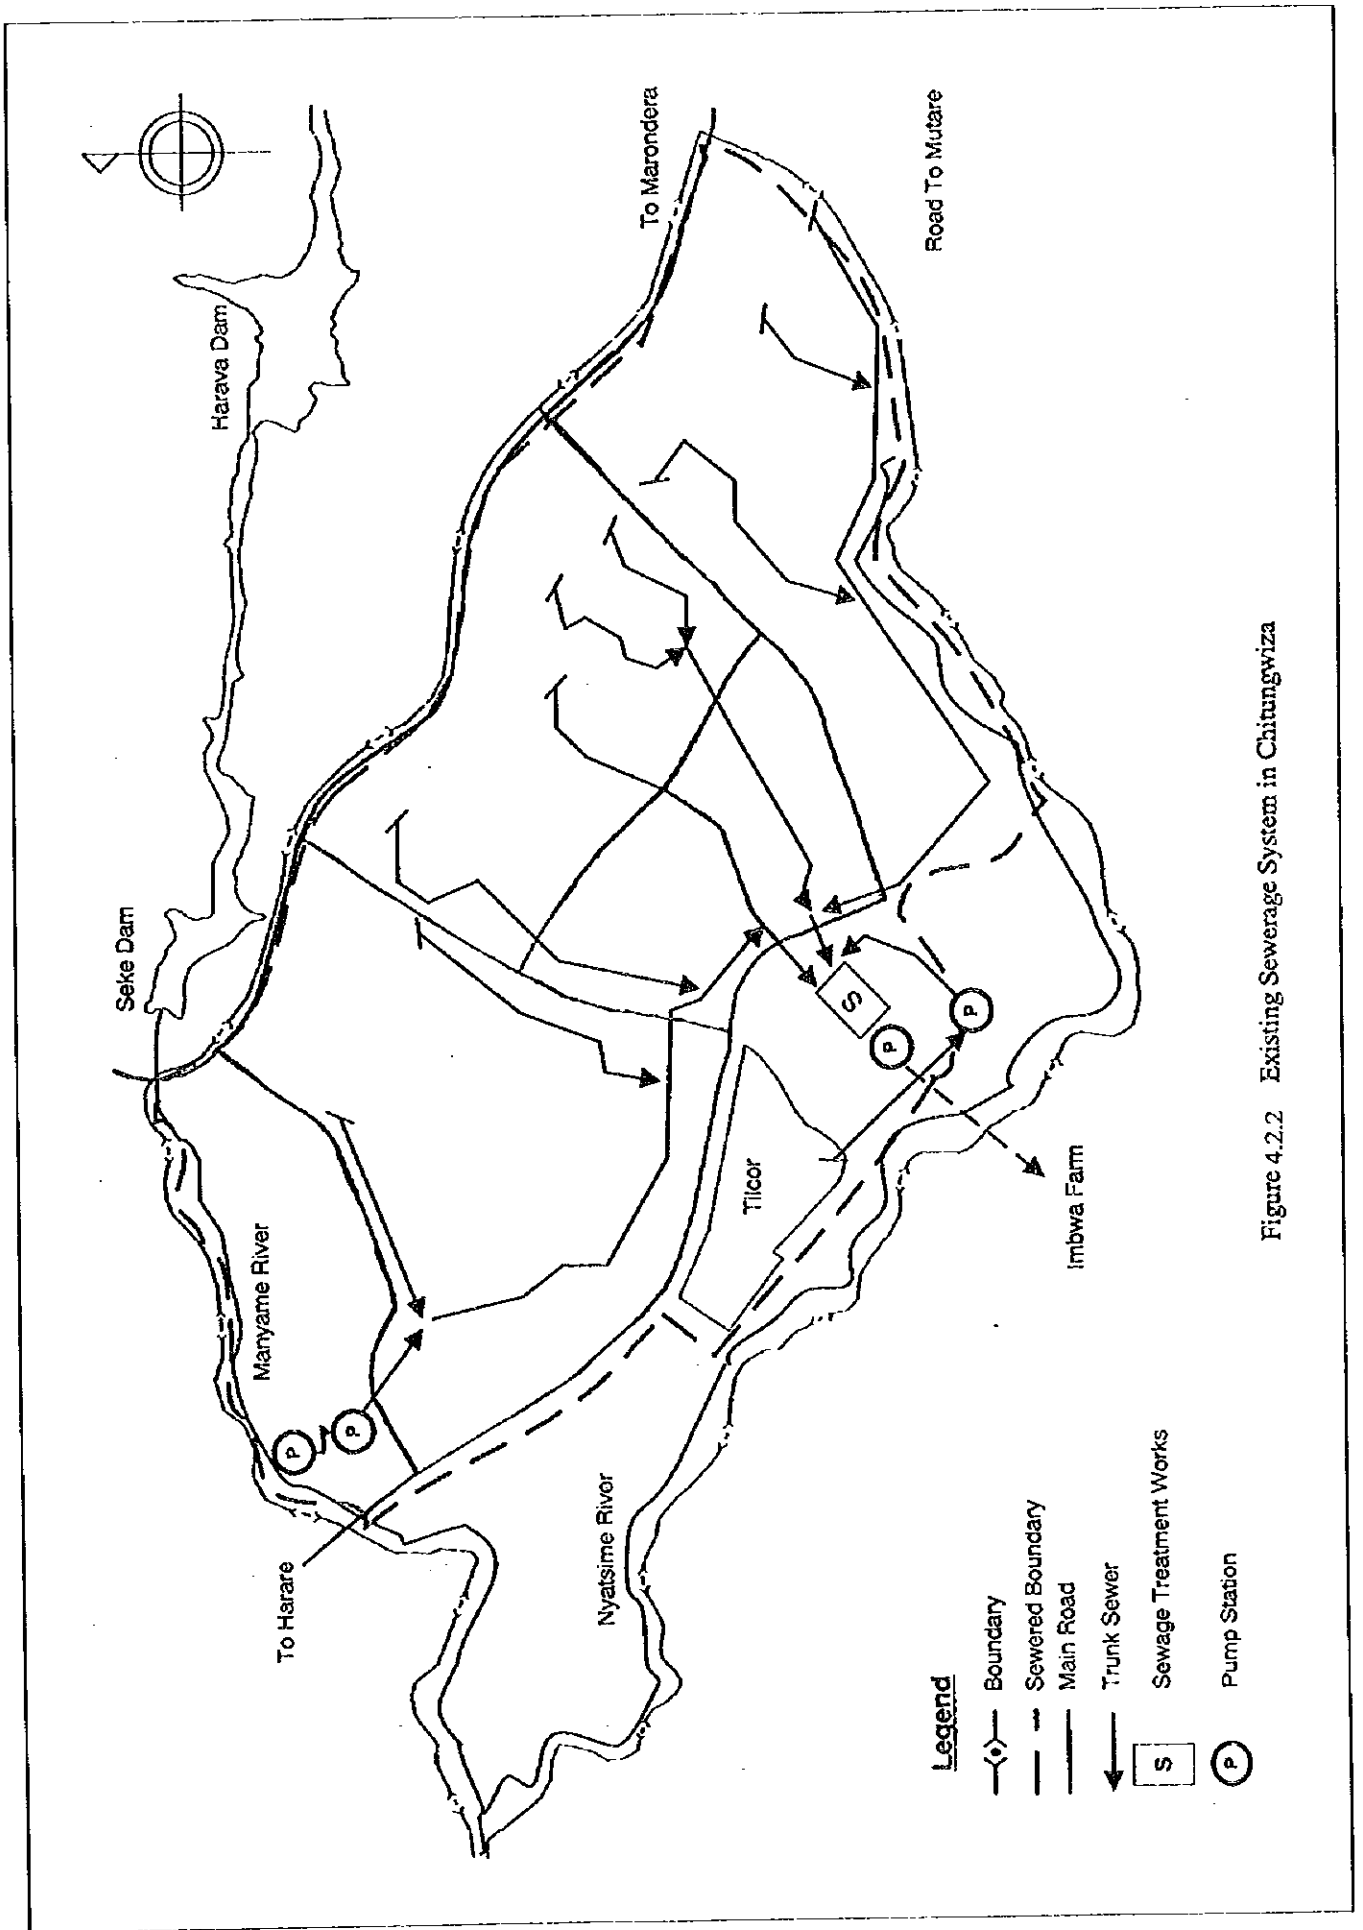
Existing Sewerage System in Chitungwiza
